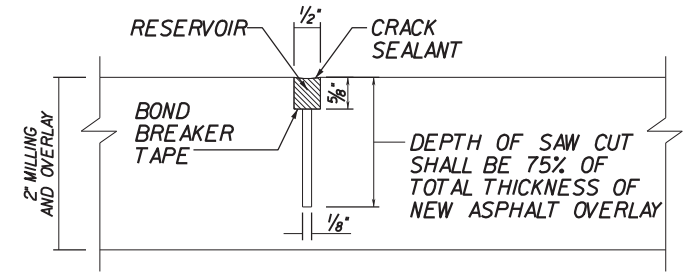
EXAMPLE JOINT REPAIR DETAILS
